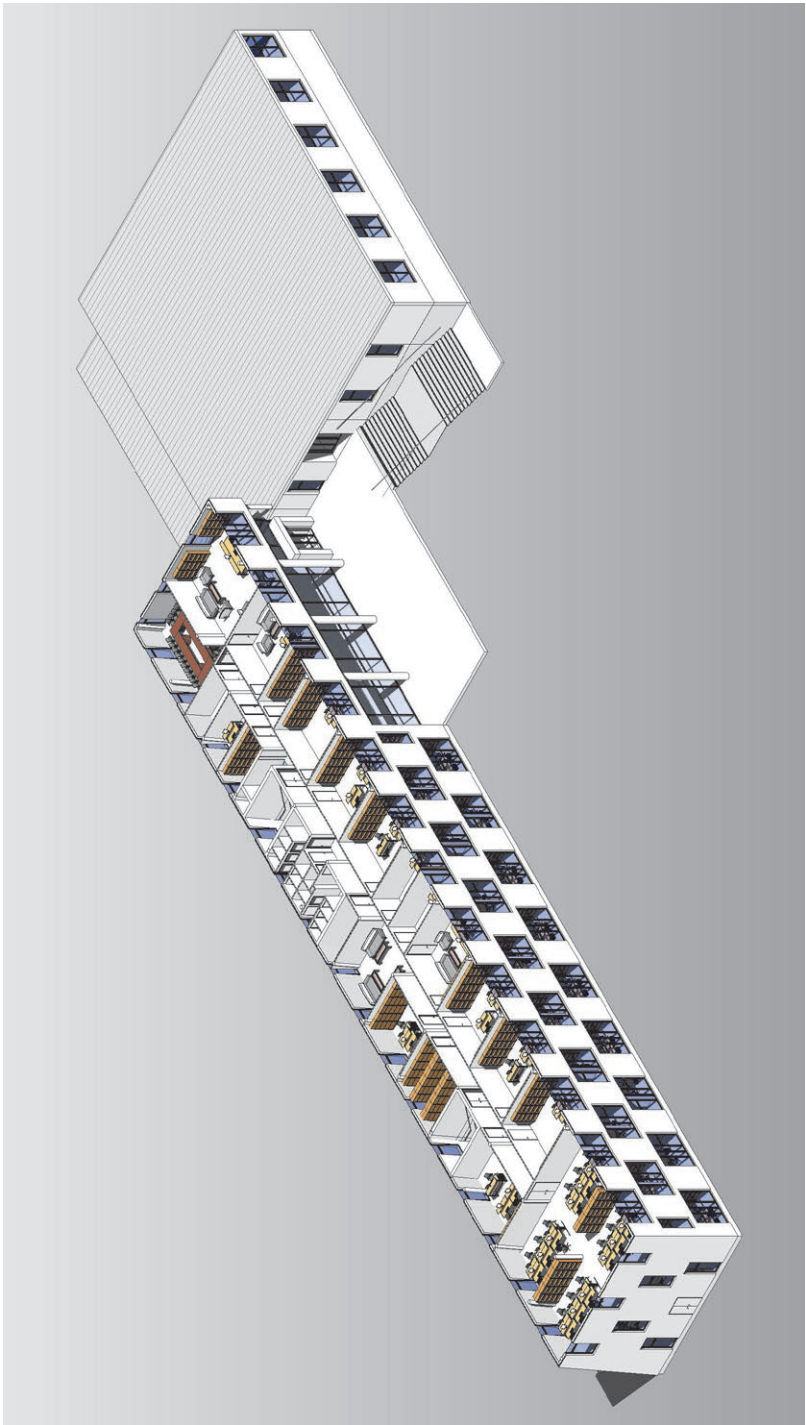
Axonometric view of the New Generation Office Building's second floor
